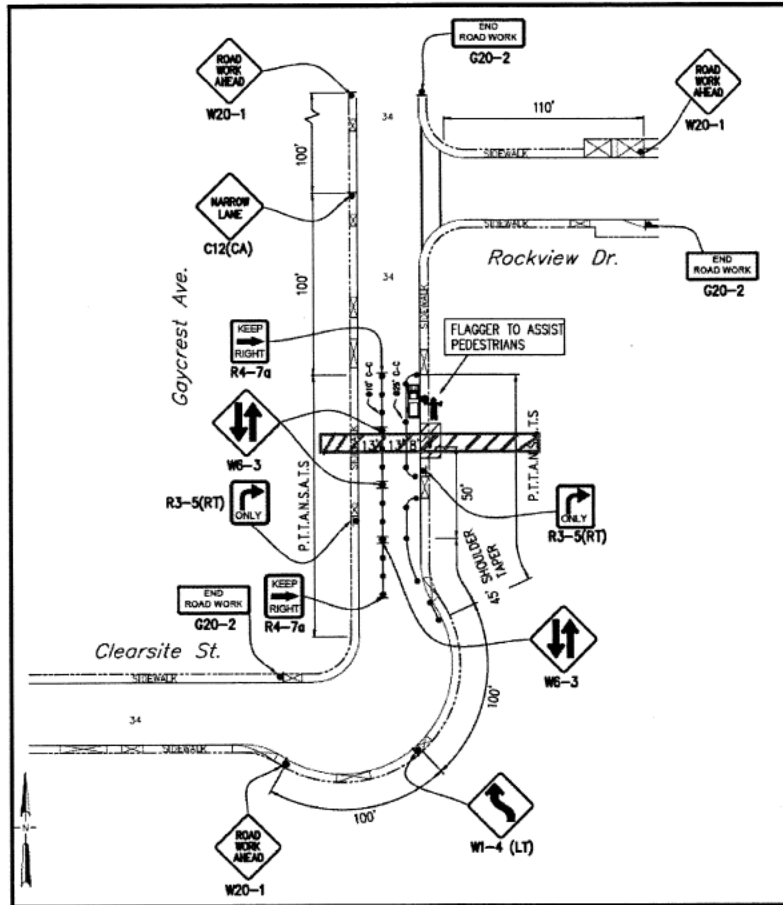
Proposed Work Area; additional Work Area for new strand and power fiber hatched in red. (Source: Plans TC-1, annotated by Dr. J. Kramer).
